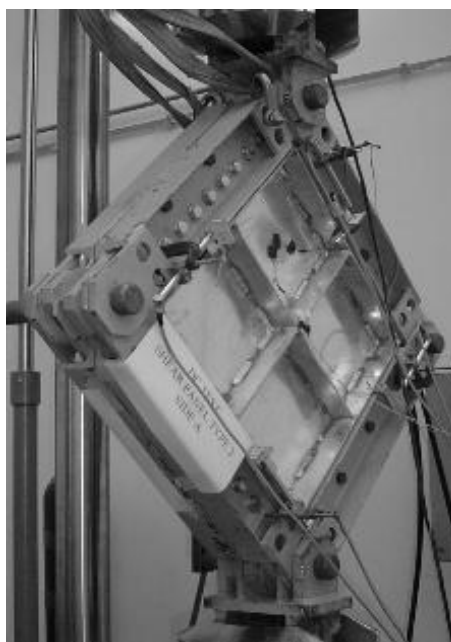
Test specimen of metal shear panels for consolidating timber structures.
